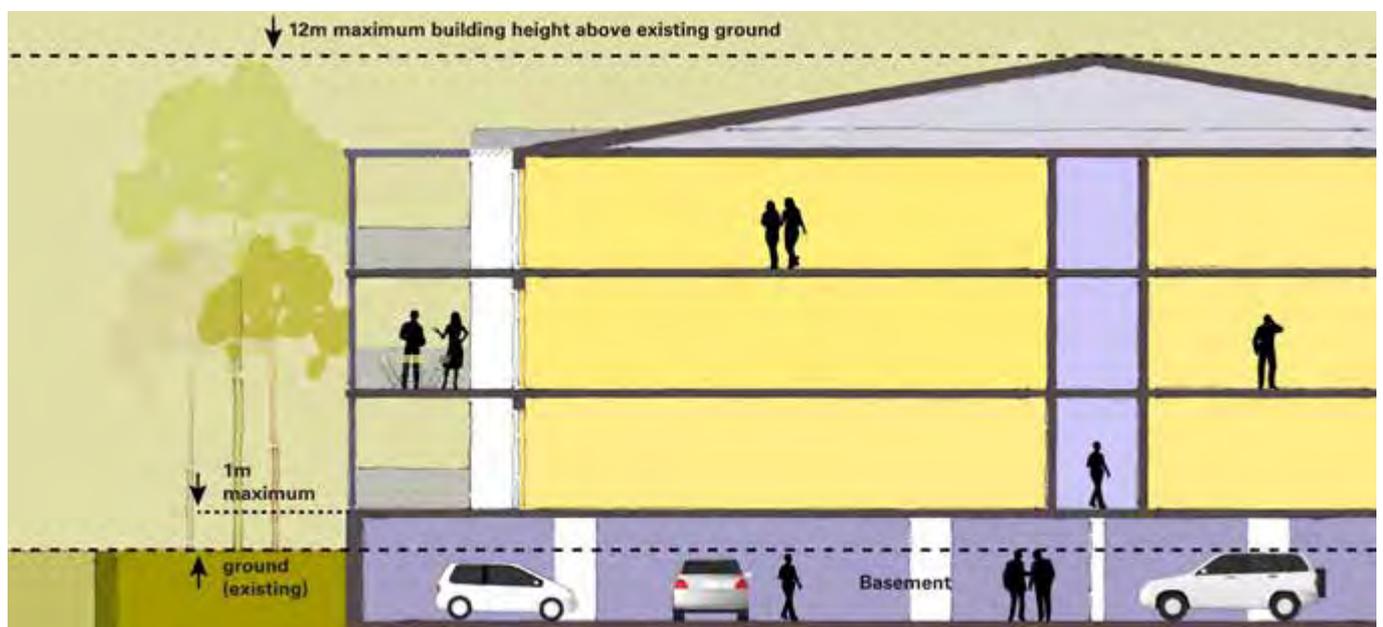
(c): Building Height. (l) Height controls are based on a typical residential floor to floor height of 3 metres, with a 2 metre allowance for roof articulation and a 1 metre basement projection.
